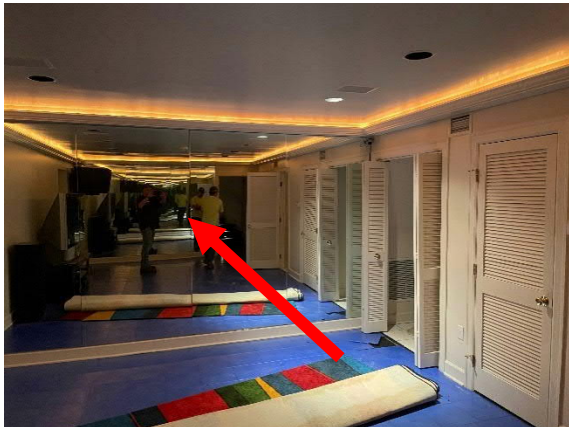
HA 117: Assumed Asbestos-Containing Glue Dots Behind Mirrors (Main House, Basement)
